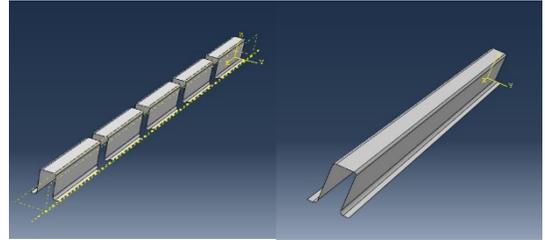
(Left) Transverse stiffener; (Right) Longitudinal stiffener
